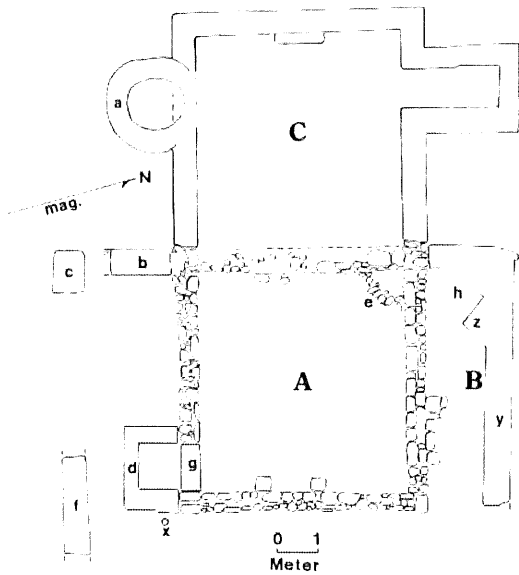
Schematic plan of the building foundation thought to be the "Printzhof."
